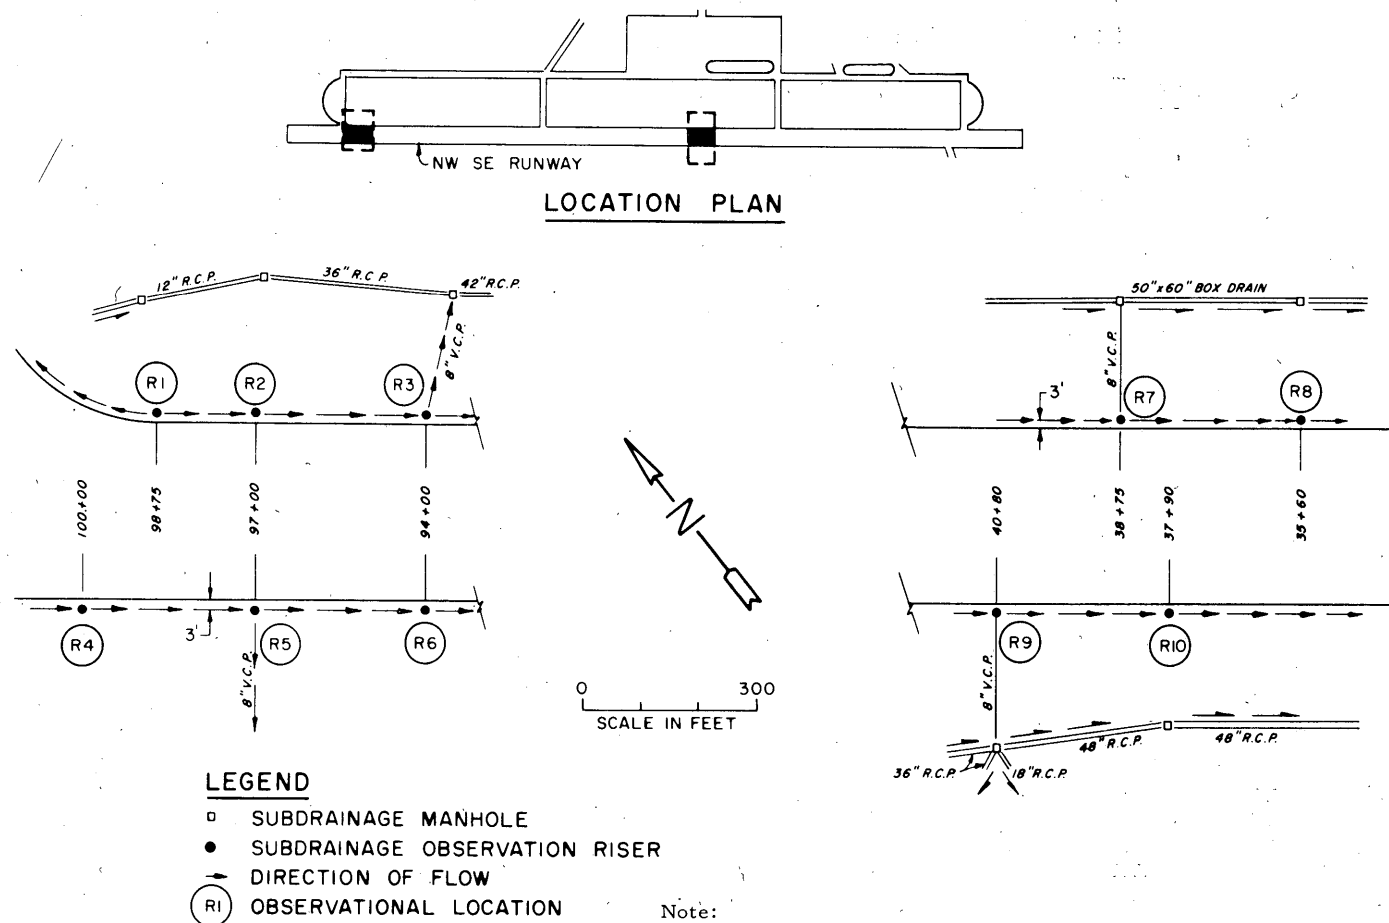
Subsurface drainage observational locations, NW-SE Runway, Dow AFB.
